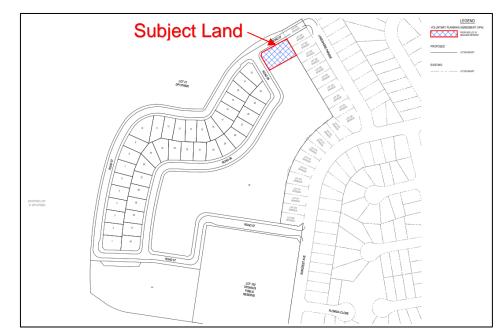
Proposed Modified Layout Plan SF10916 (MA2024/1490)– land to be dedicated outlined in red (adapted from plan by MAKER Engineers)
